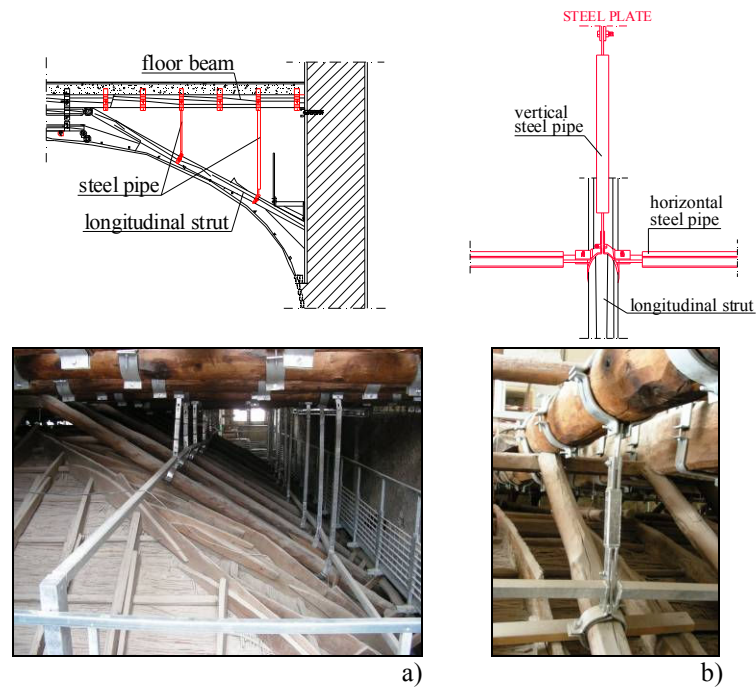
Diplomatic Hall (II) – Retrofitting interventions – Stiffening systems for longitudinal struts: a) Structural section and general view; b) Vertical and horizontal steel pipe details.
